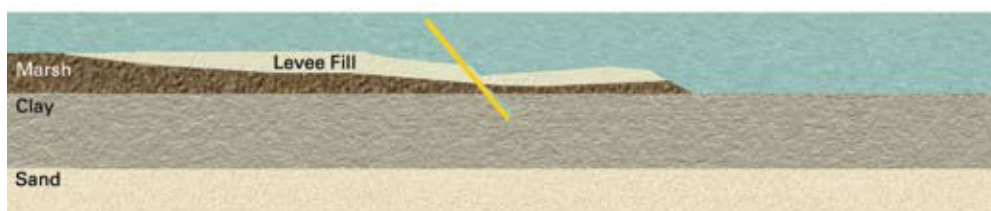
Overtopped I-wall Failure Mechanism
